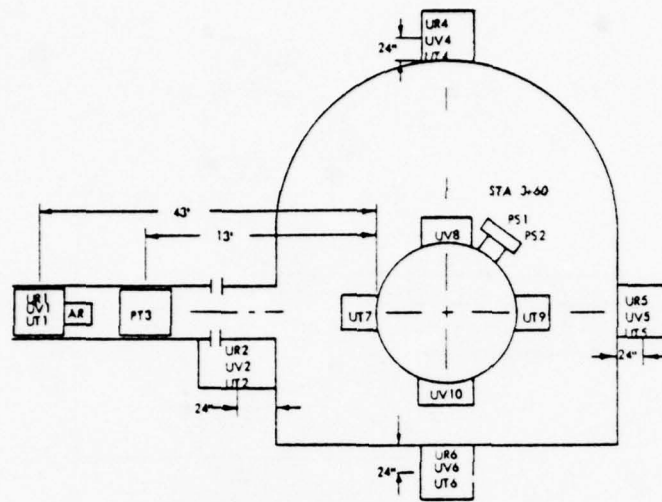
Elevation view: Pressure, acceleration, and velocity gage installation in sand stem, Station 3+60, looking toward WP. (POR 6389)
